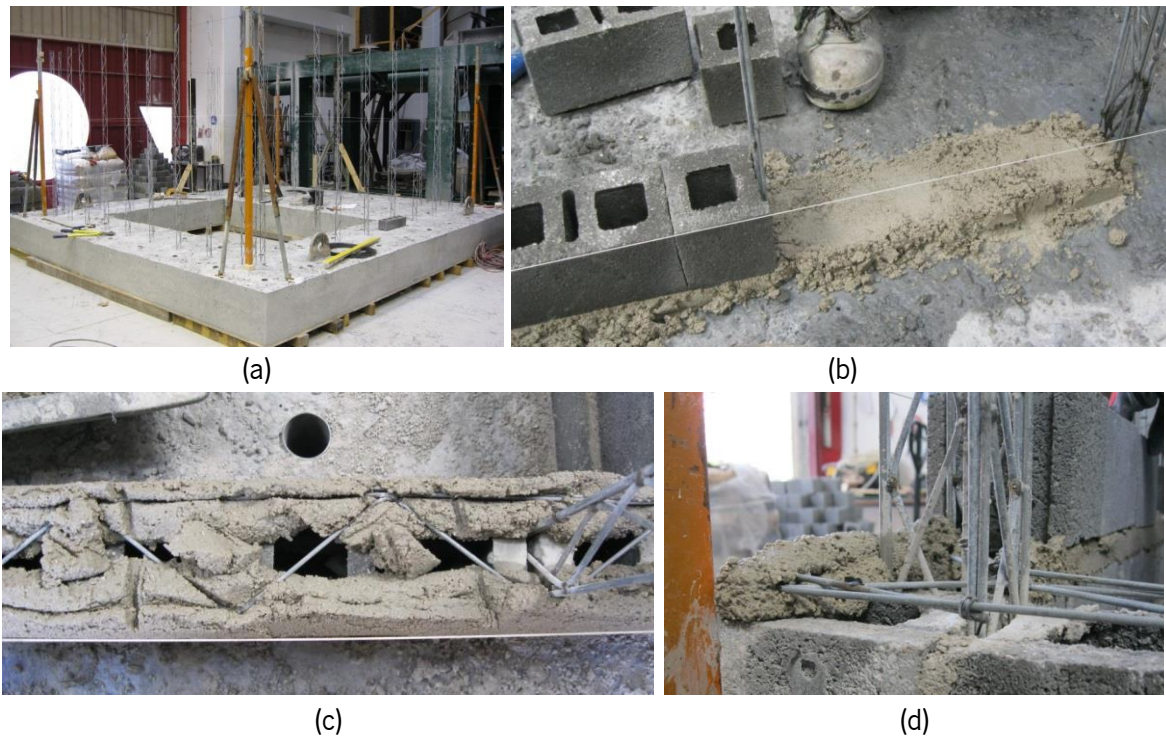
Construction process: (a) foundation with vertical steel, (b) installation of first masonry row, (c) horizontal joint with reinforcement and (d) detail of mortar covering reinforcement
